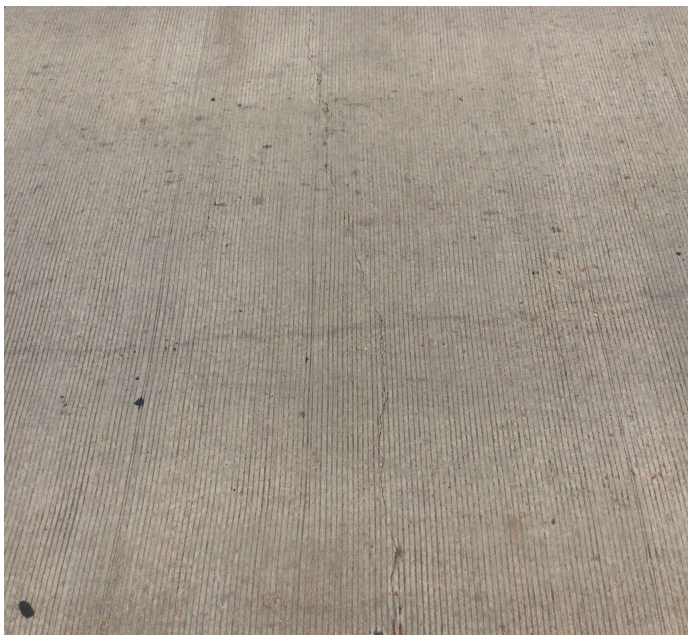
Description Typical transverse deck cracks spaced 4' +- all spans.
